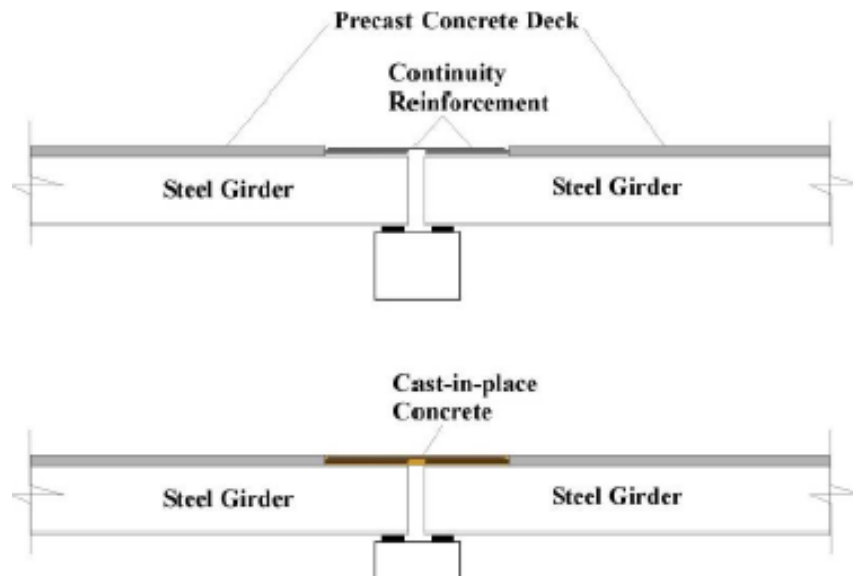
Continuous Precast Modular Bridge Concept (SDR Engineering Consultants 2005)
